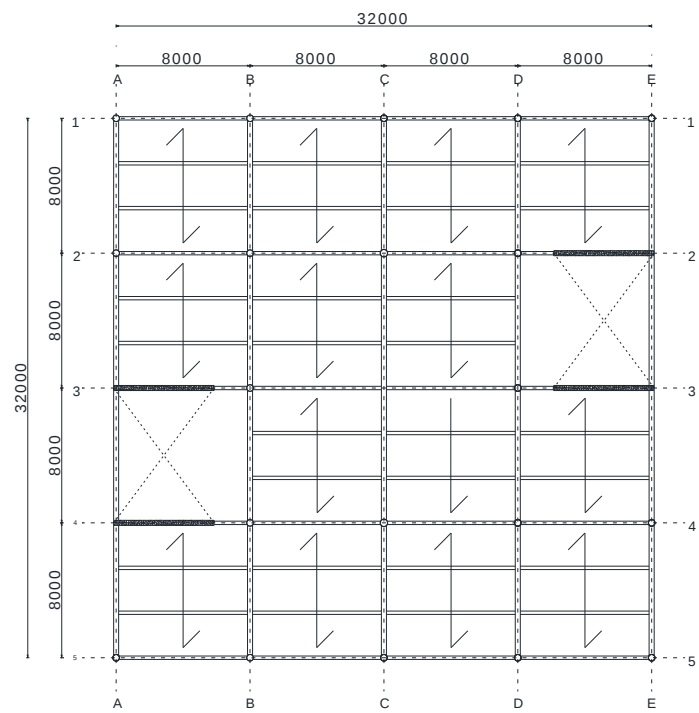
Plan view for the 4th floor of 3D Structure.
